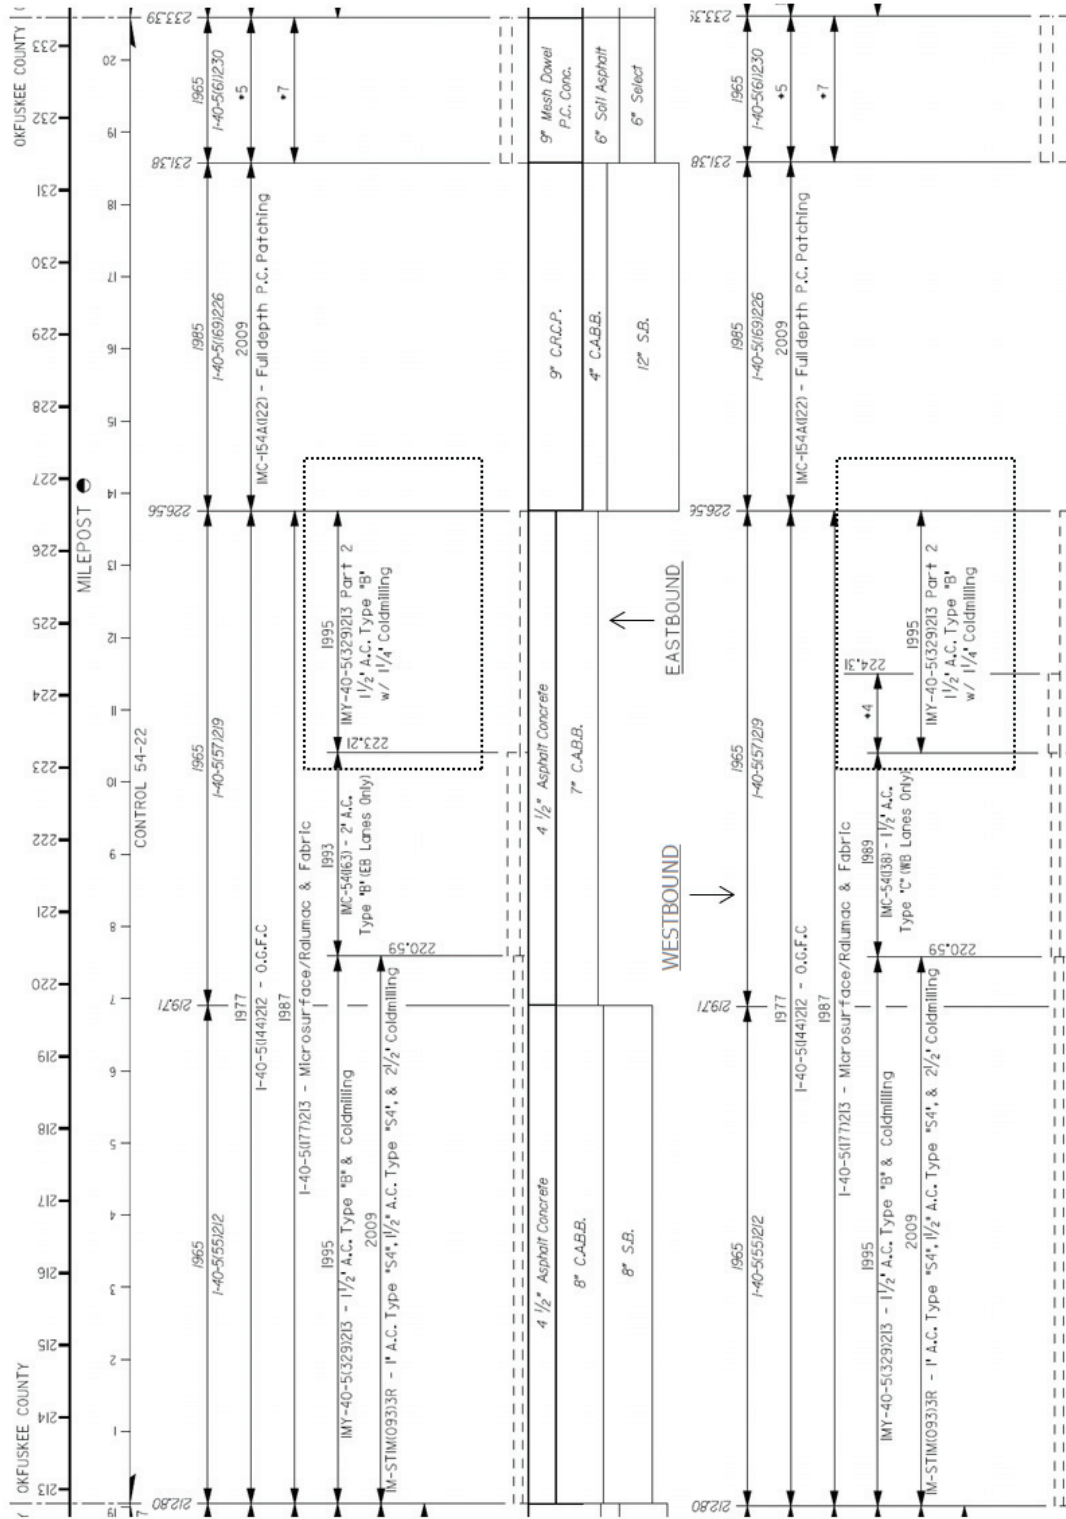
Structural Pavement History for Control Section 54-22 (Eastbound and Westbound)
